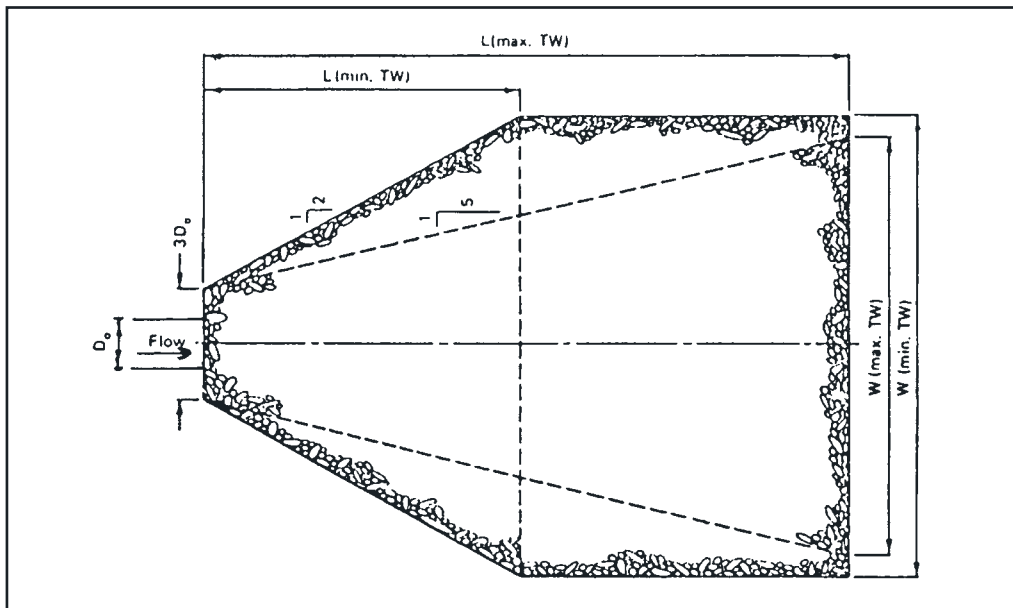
Riprap configuration for outlet protection under both maximum and minimum tailwater conditions (Bohan, 1970)
